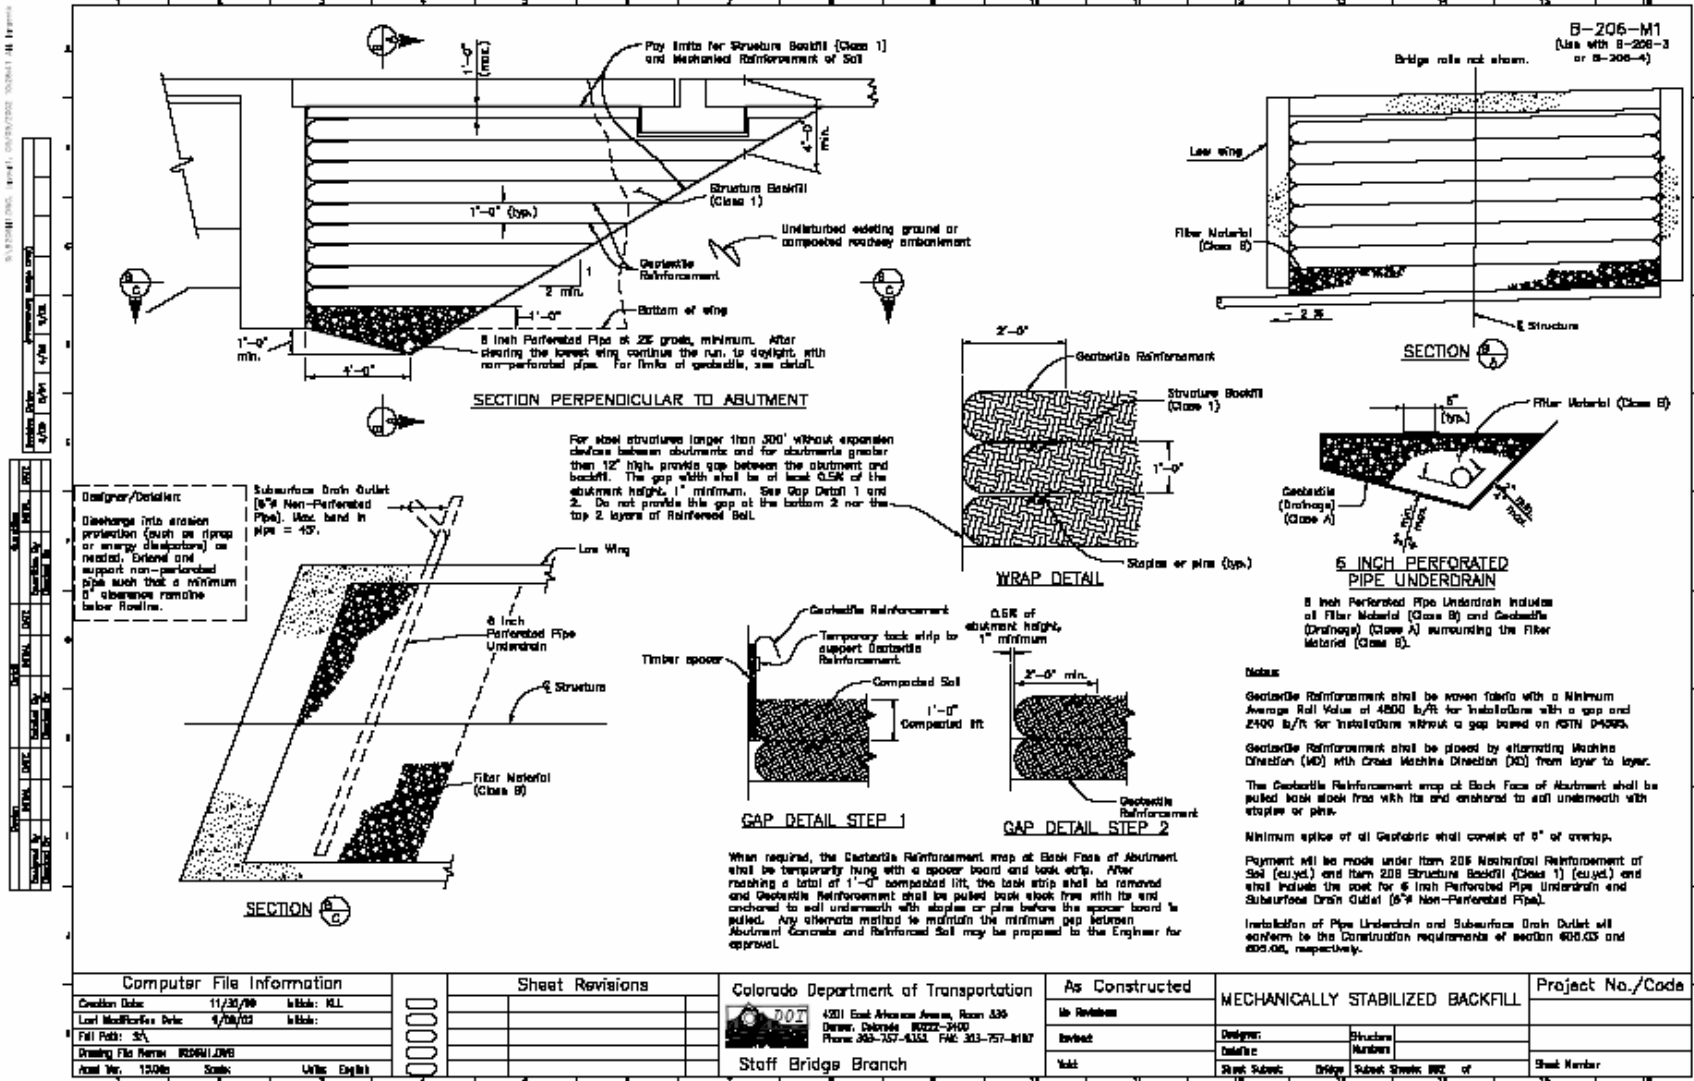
Details for Bridge Approaches Constructed with MSE Class 1 Backfill
